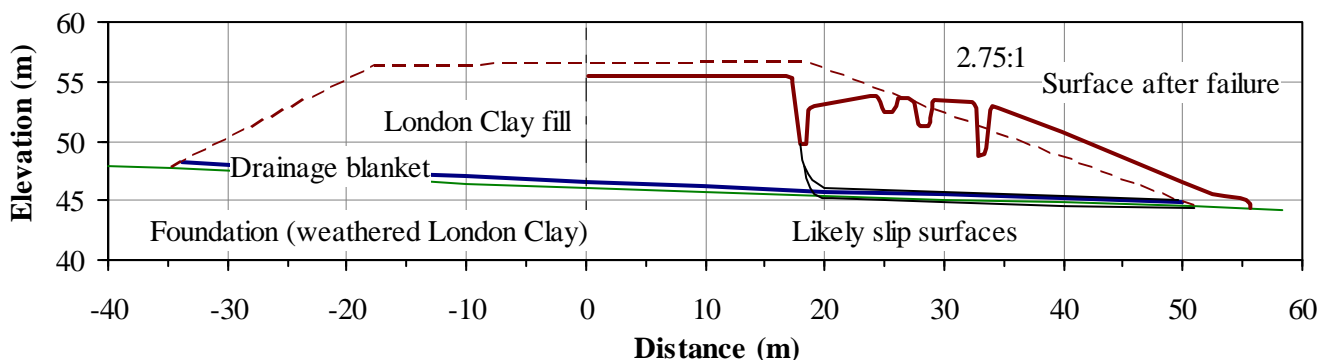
Section through Hill Hall embankment on the M25 near London, UK
